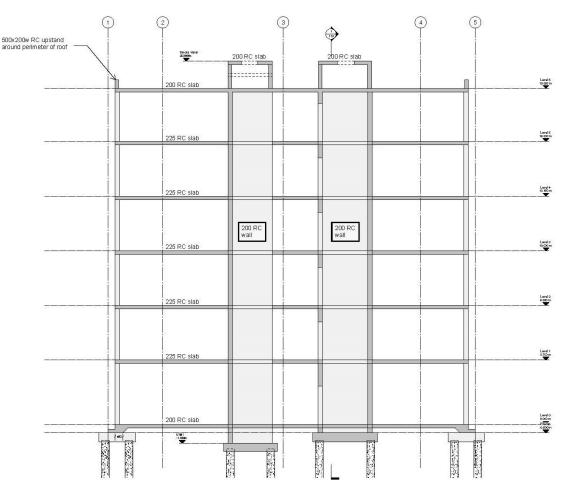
Typical six-storey concrete frame residential apartment block (MPA The Concrete Centre, 2021). The scenario adopted for the module A5 construction and module B1 use stages is based on the use of ready-mixed concrete in the building superstructure.
